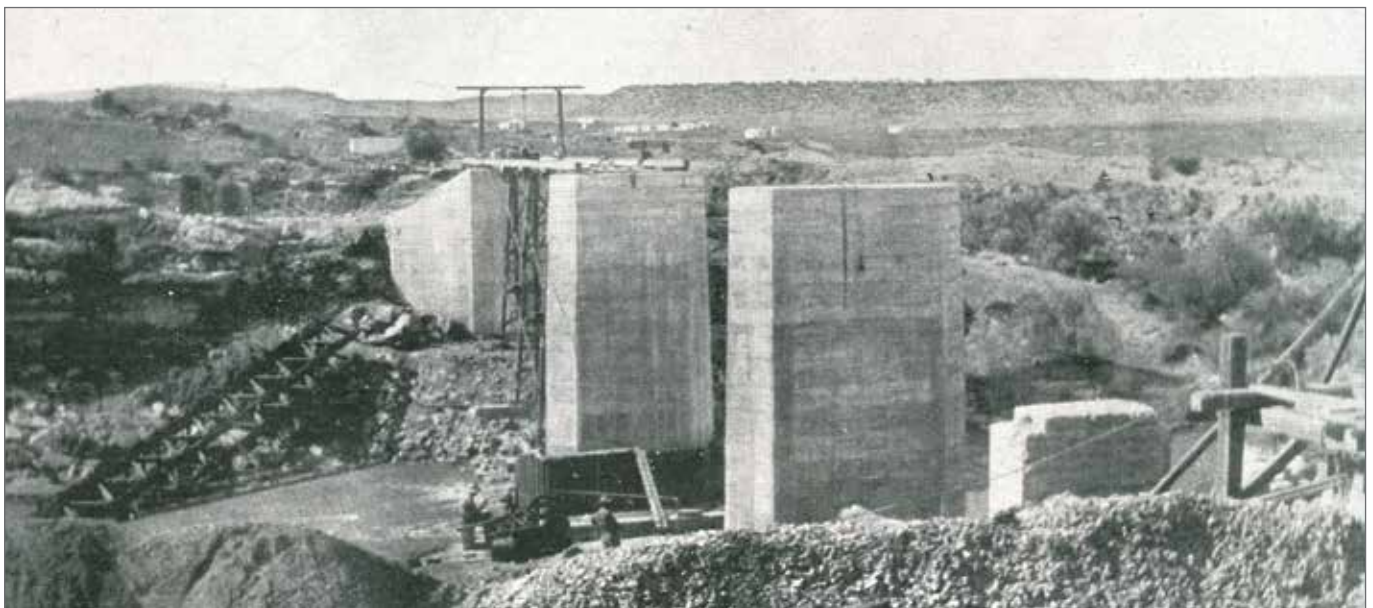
New permanent bridge under construction, 8 May 1926 (SA Railways and Harbours Magazine, August 1926)
